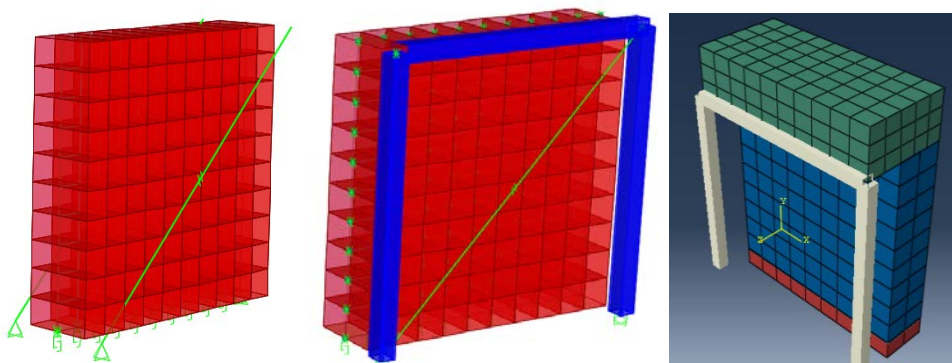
Numerical models of masonry wall reinforced with mechanical dampers without metal frame (a) and with metal frame in SAP2000 (b) and ABAQUS (c)
